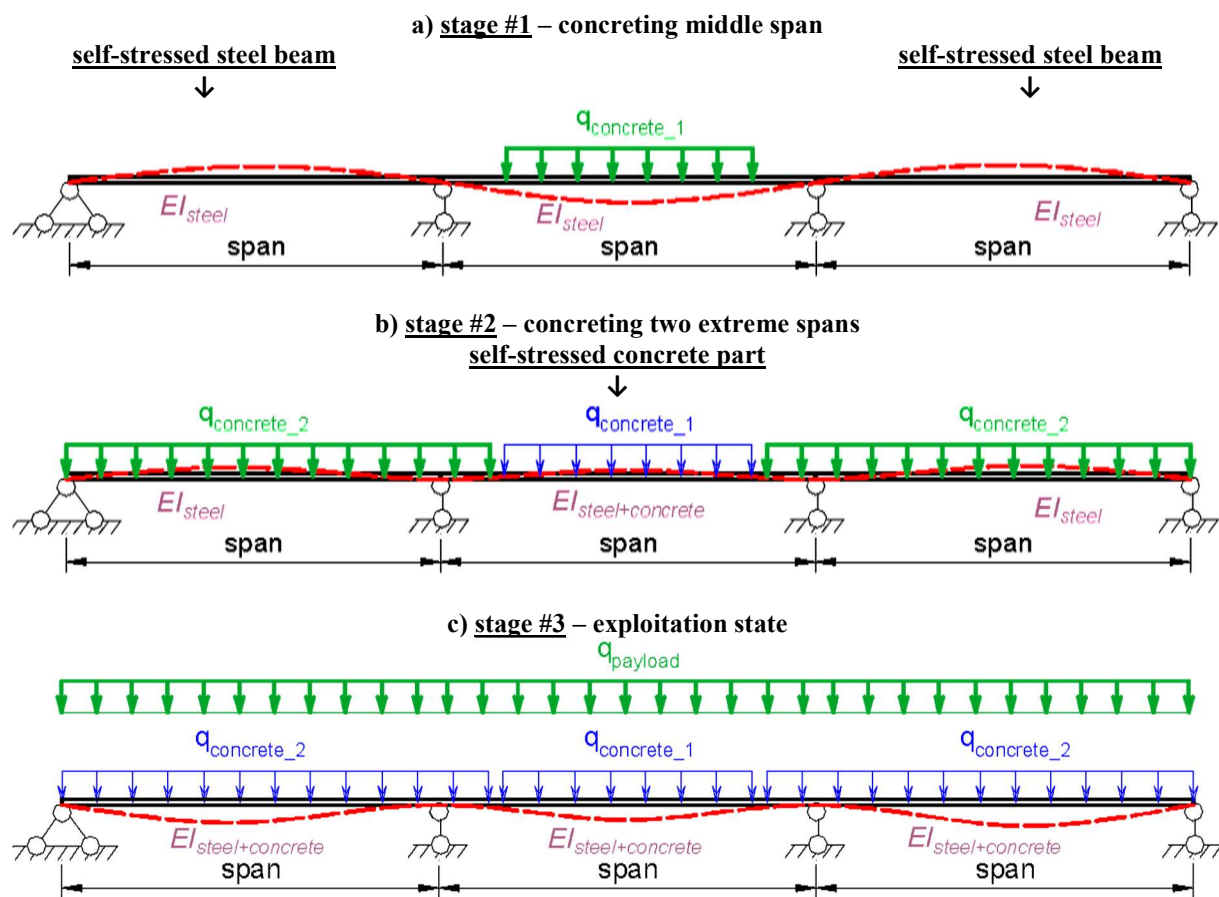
The stages of the manufacturing preliminary self-stressed steel concrete slab
